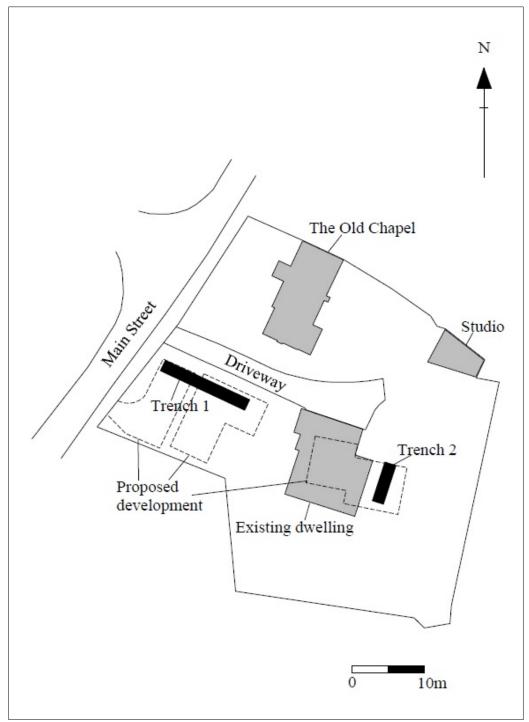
Site plan with position of evaluation trenches, in black; existing buildings shaded in grey; proposed development as dashed line
